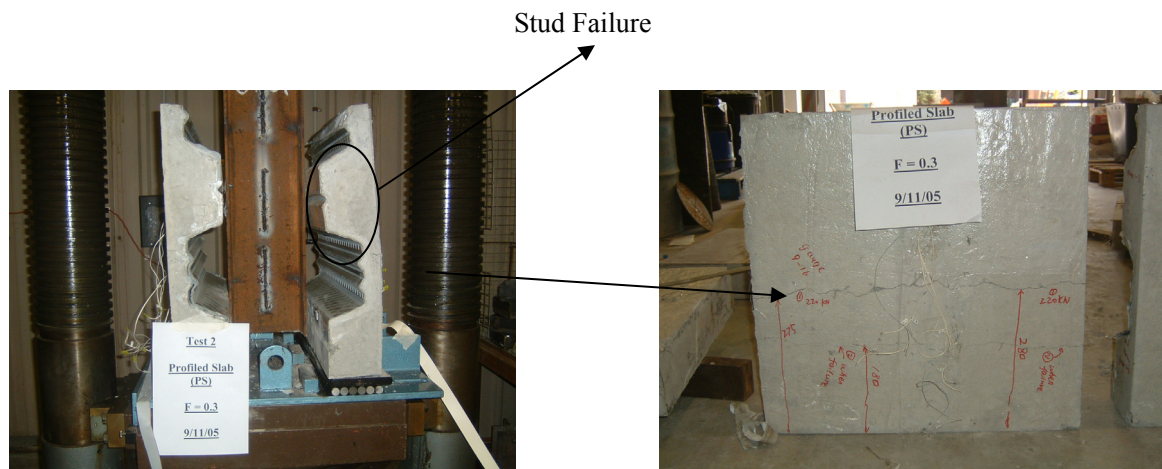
Stud Failure for Concrete with $F=0.3$ Fibres
